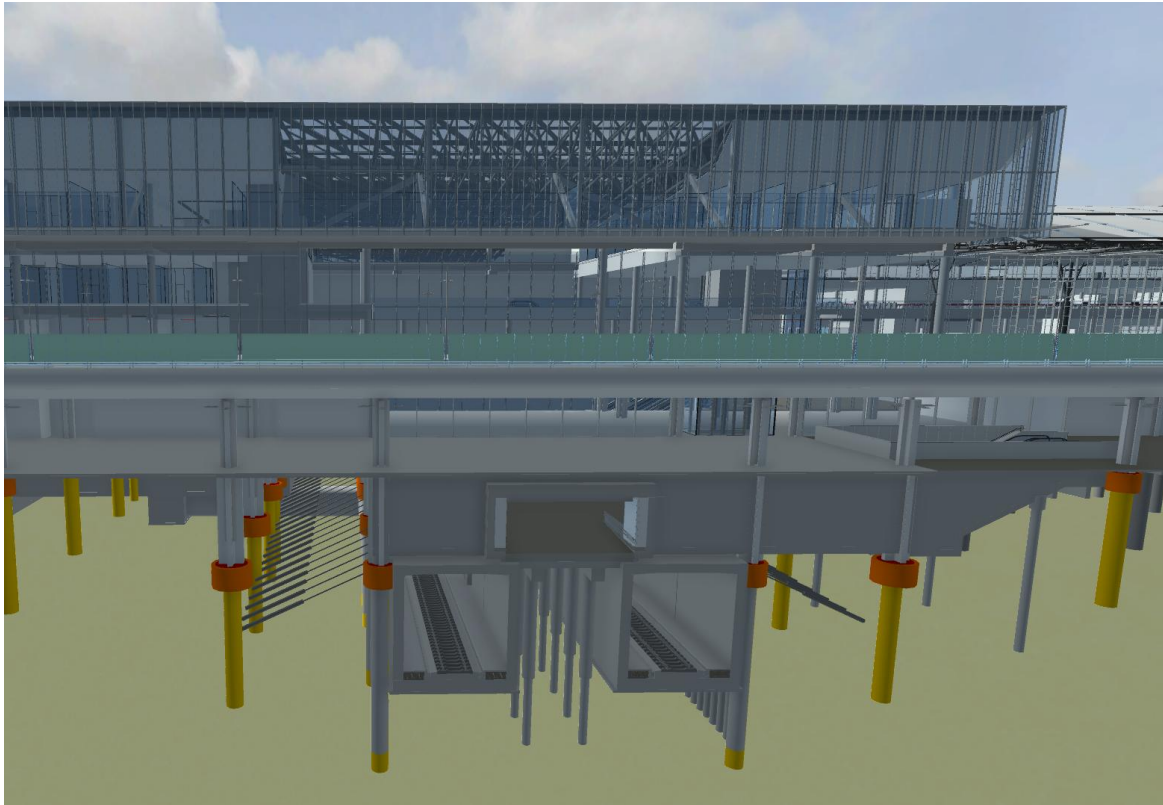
3D model with a depiction at the site of a pair of tunnels, a vestibule, an elevated road and a building of the Terminal 2 extension
